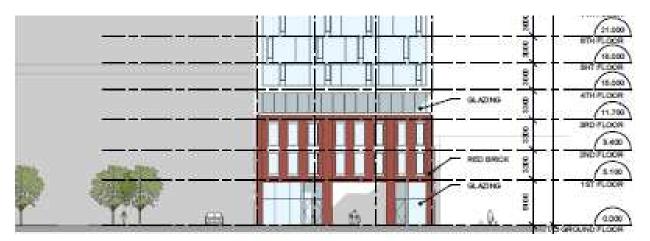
North (Slater) elevation detail. Note the three storey brick clad podium with a fenestration pattern that mimics the fenestration pattern of the adjacent building fronting onto Bank Street (Figure 6). The building features three bays with a central access drive to the rear. Source: RLA May 24 2019.
